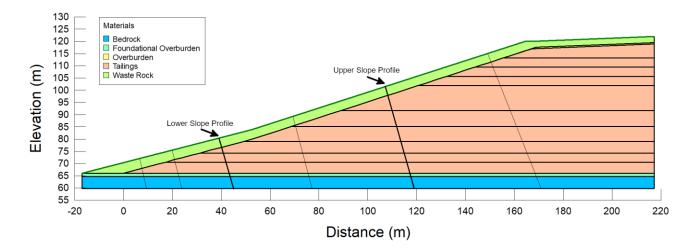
2D cross section developed for long-term Meliadine Extension modelling.
